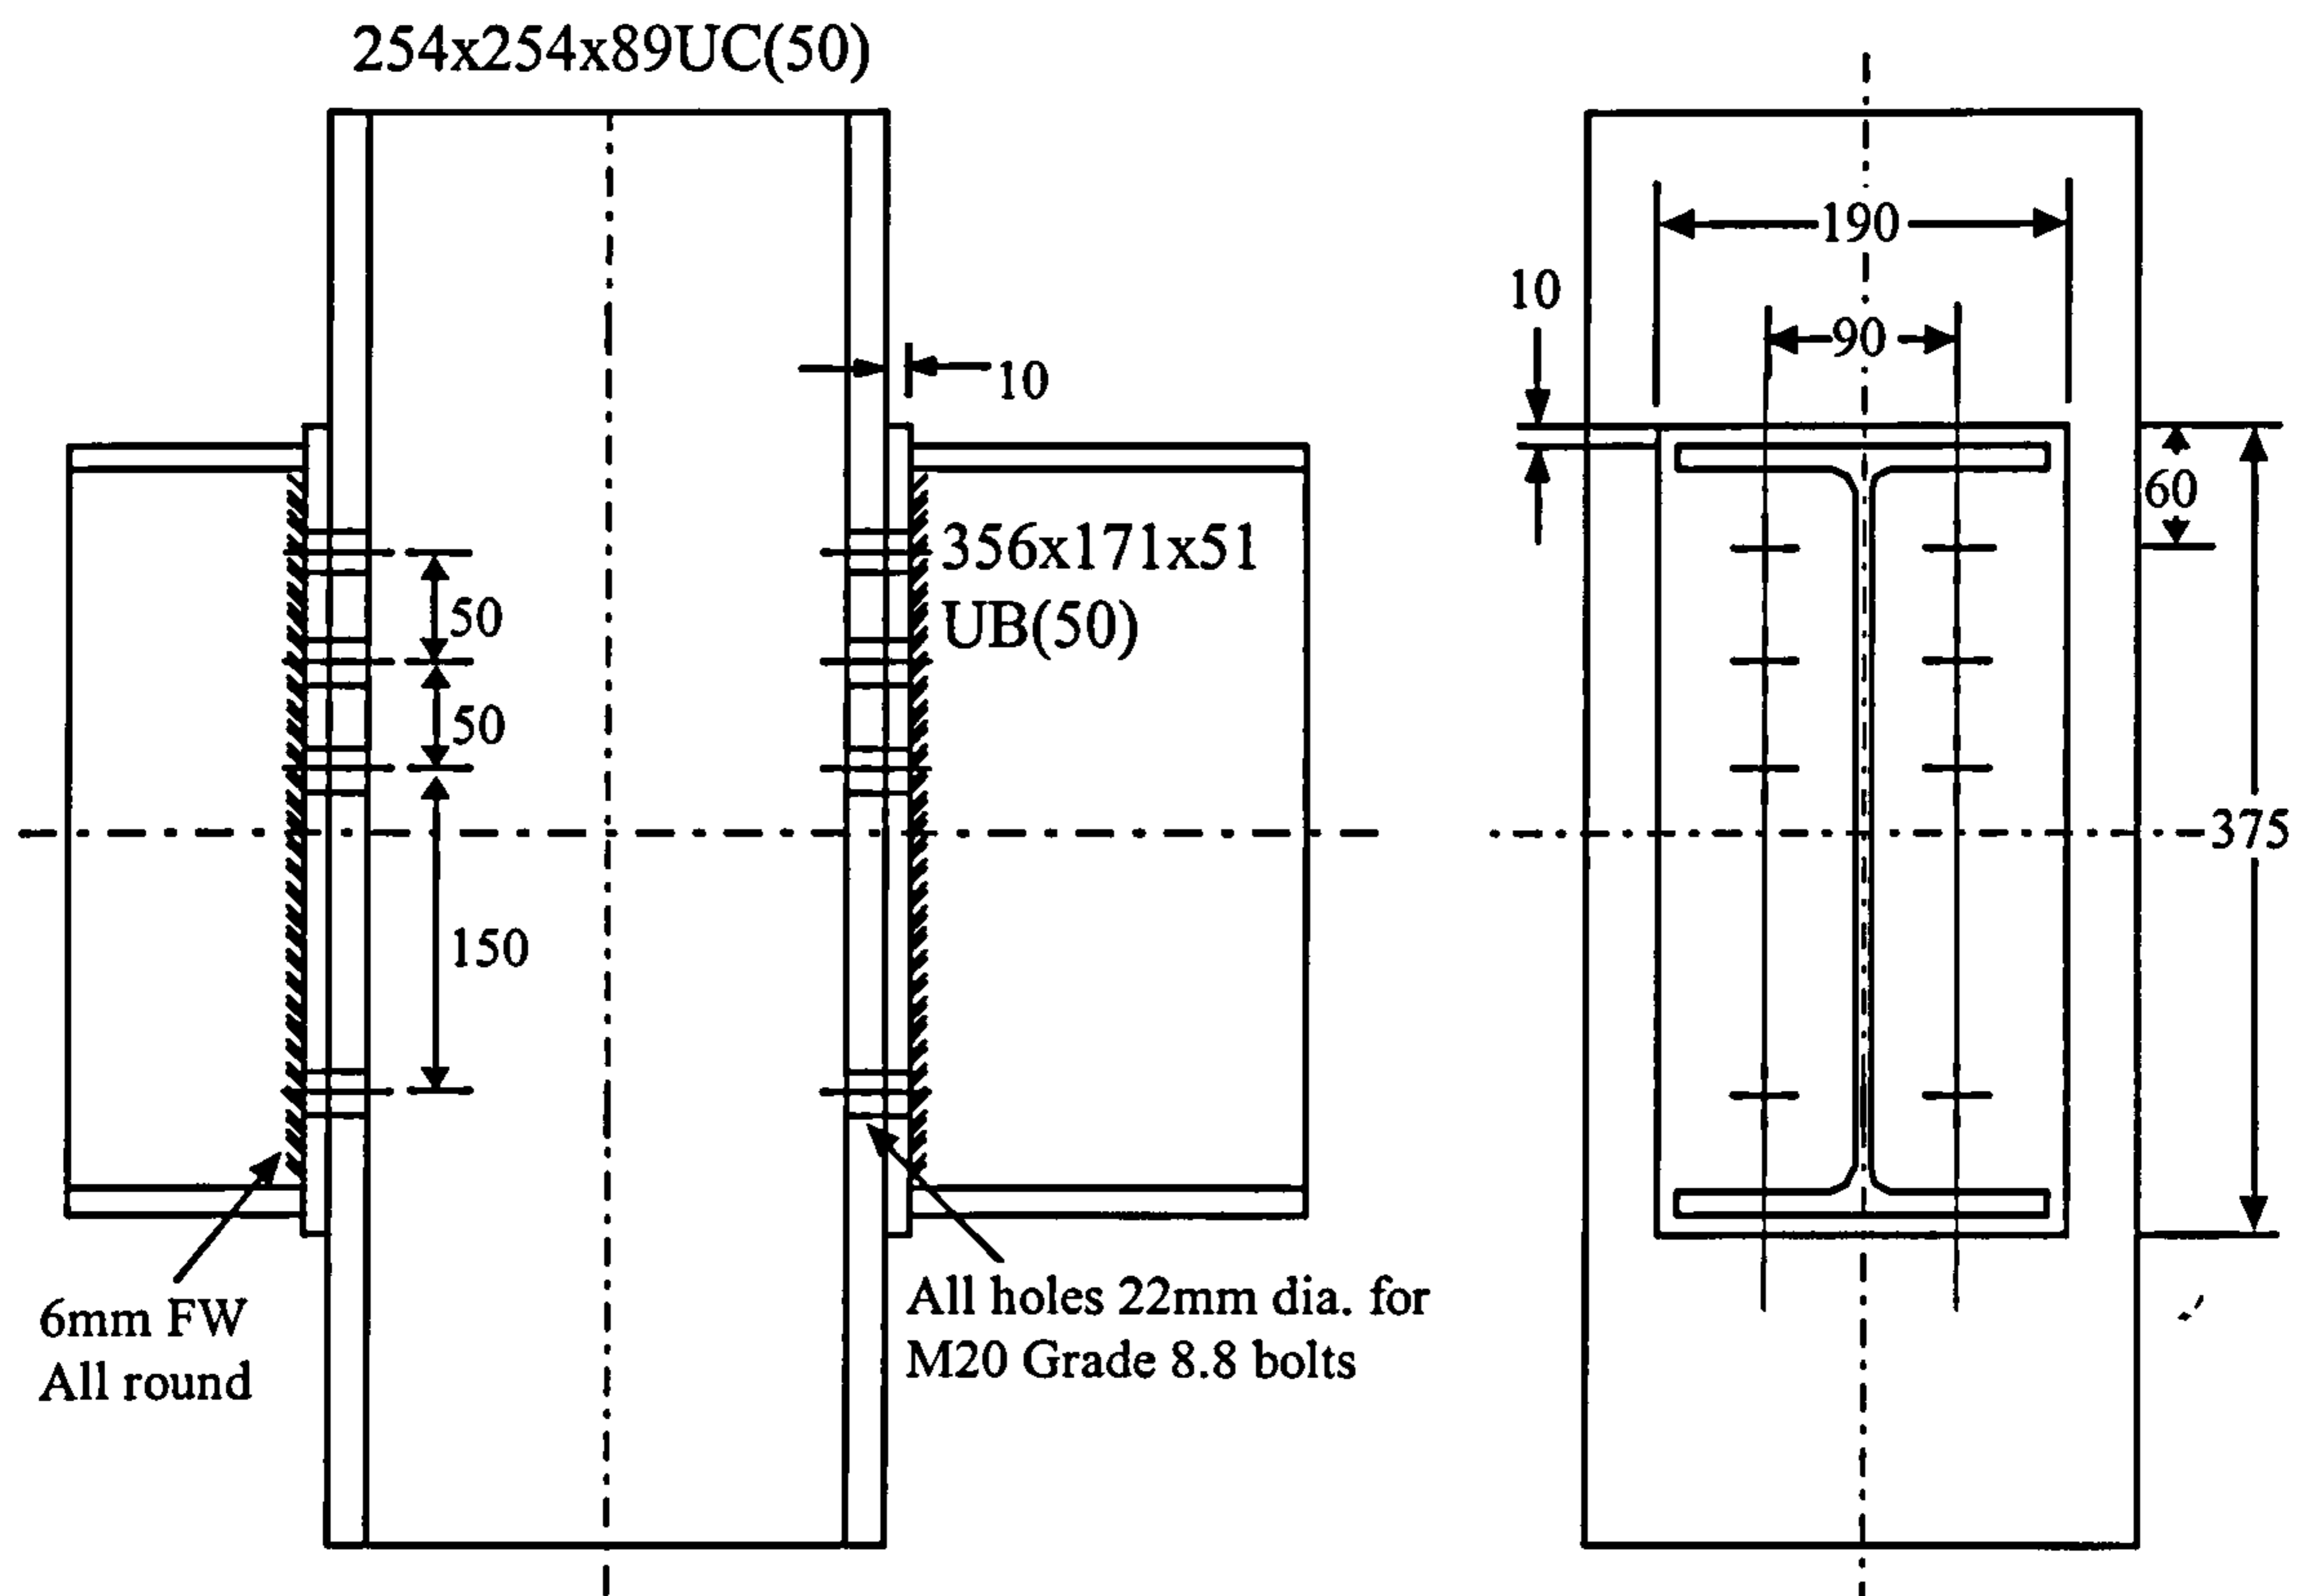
Bare-Steel Flush End-Plate Connection Detail (Group 2)
